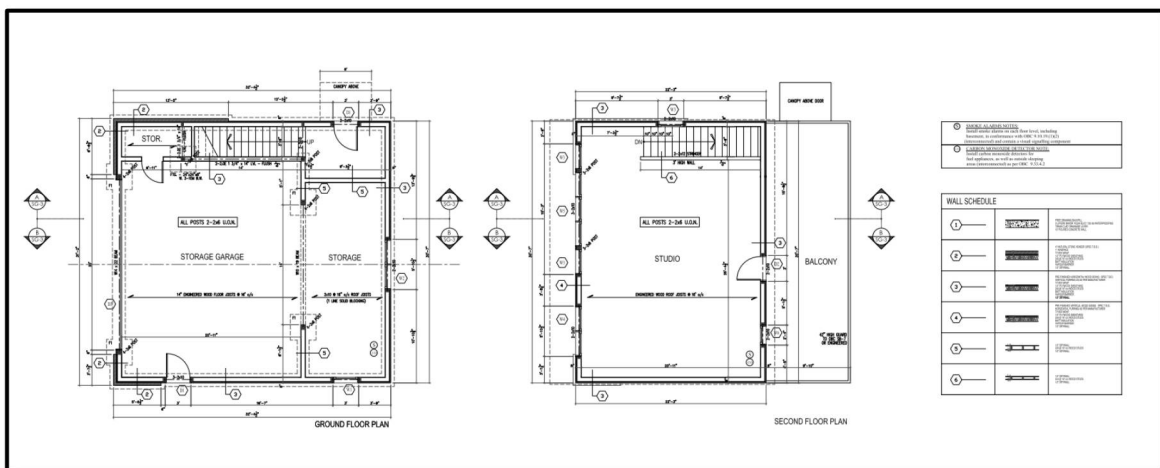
Ground Floor and Second Floor Plans for the northern accessory building
